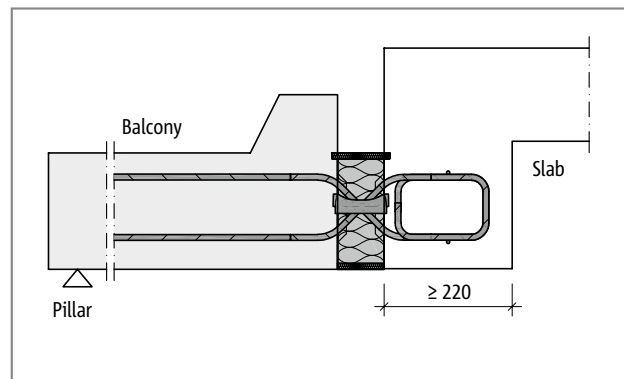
Schöck Isokorb® T type Q-E-W-VV: Installation situation "pre-cast balcony slab"
